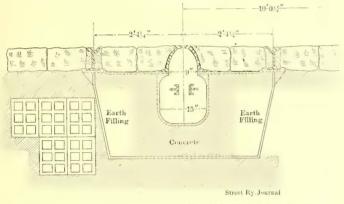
THIRD AVENUE CONSTRUCTION FOR CABLE
